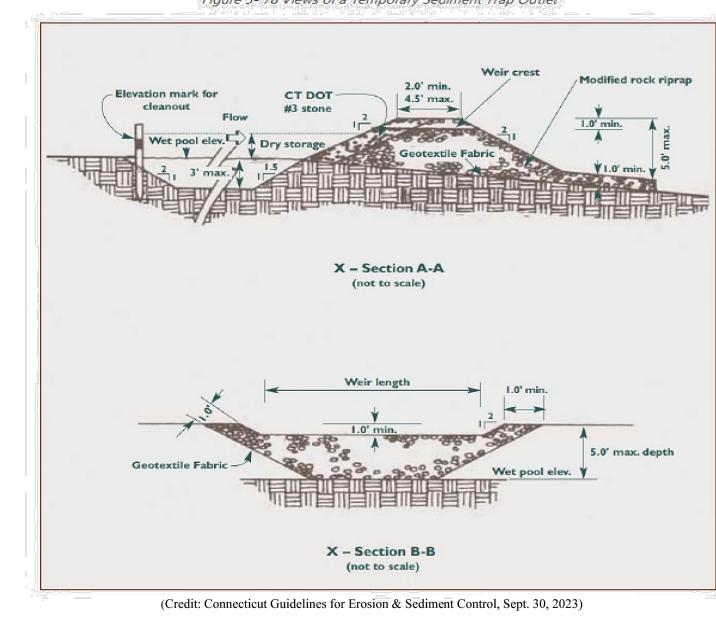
78 Views of a Temporary Sediment Trap Outlet
